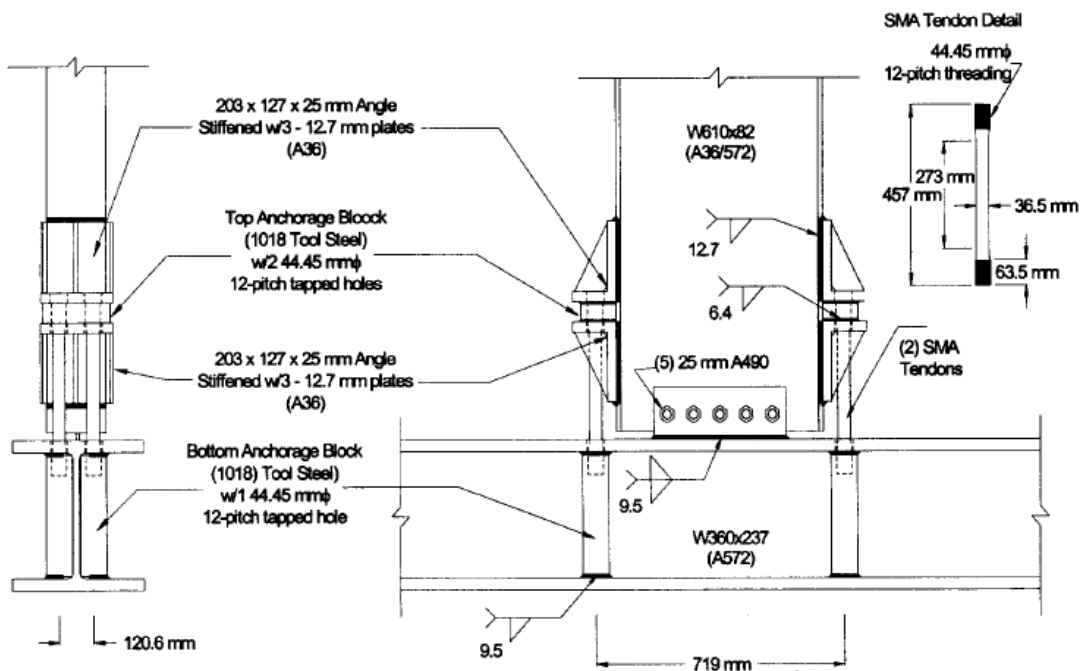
Details of Second SMA Beam-Column Connection
